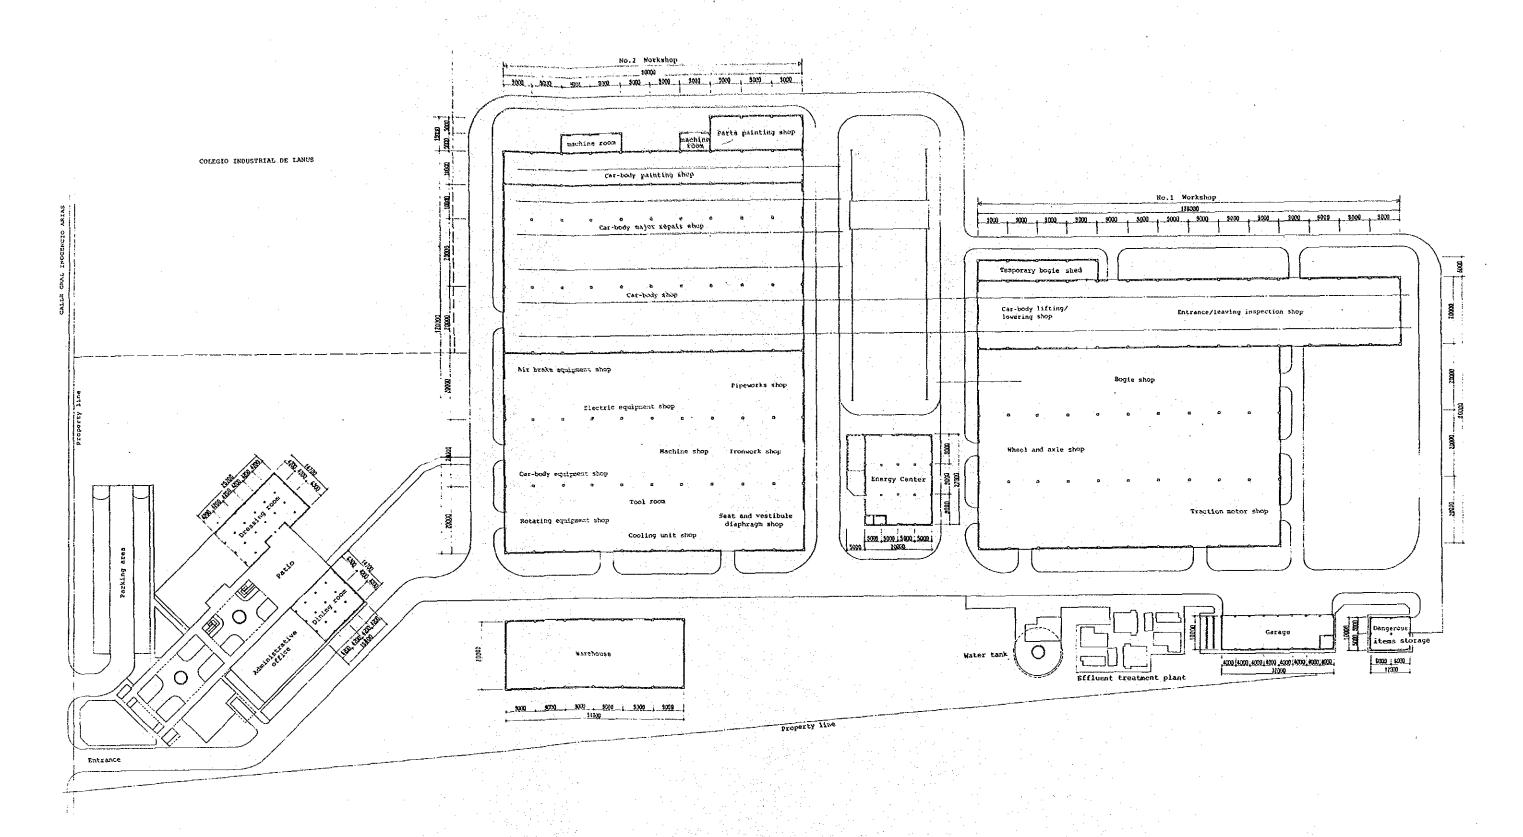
Layout of KM 10 Workshop Buildings Proposal III
